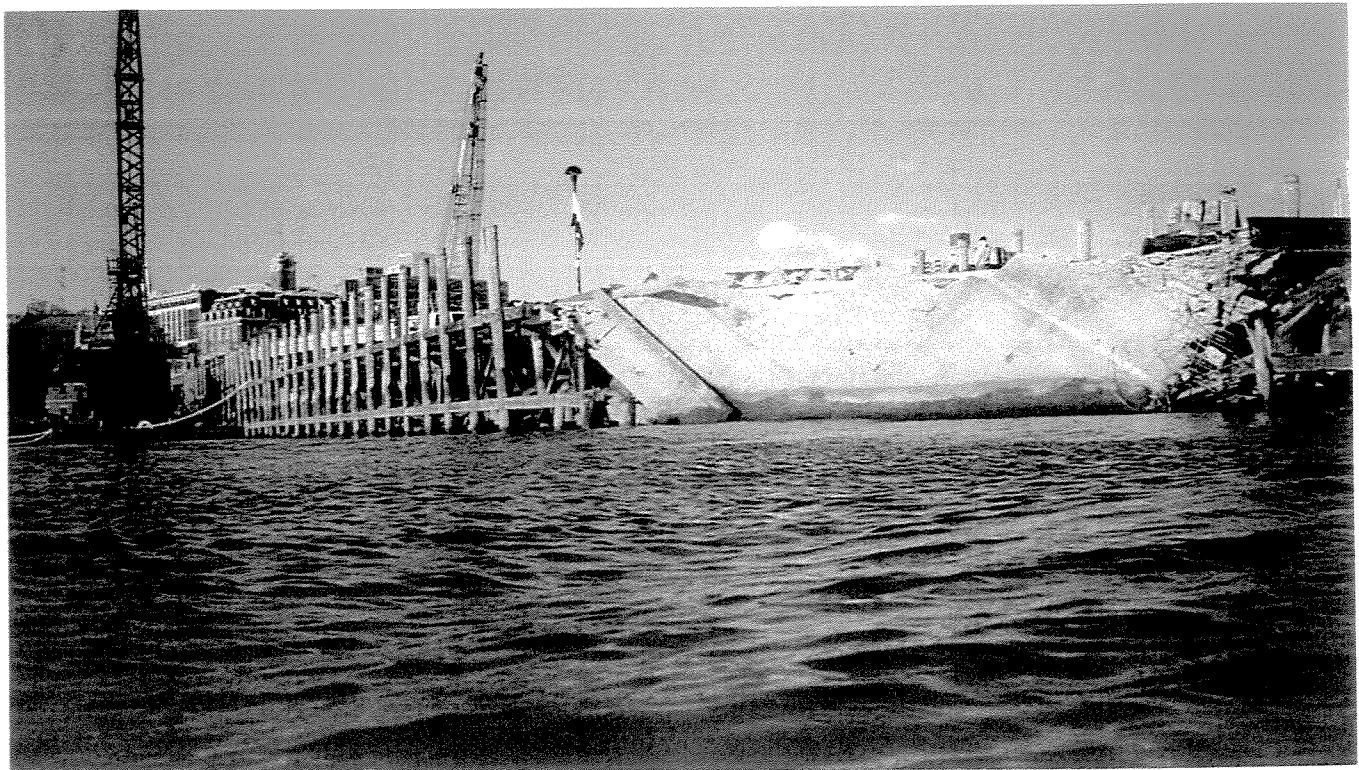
General view of pier with collapsed SE corner, looking west.
